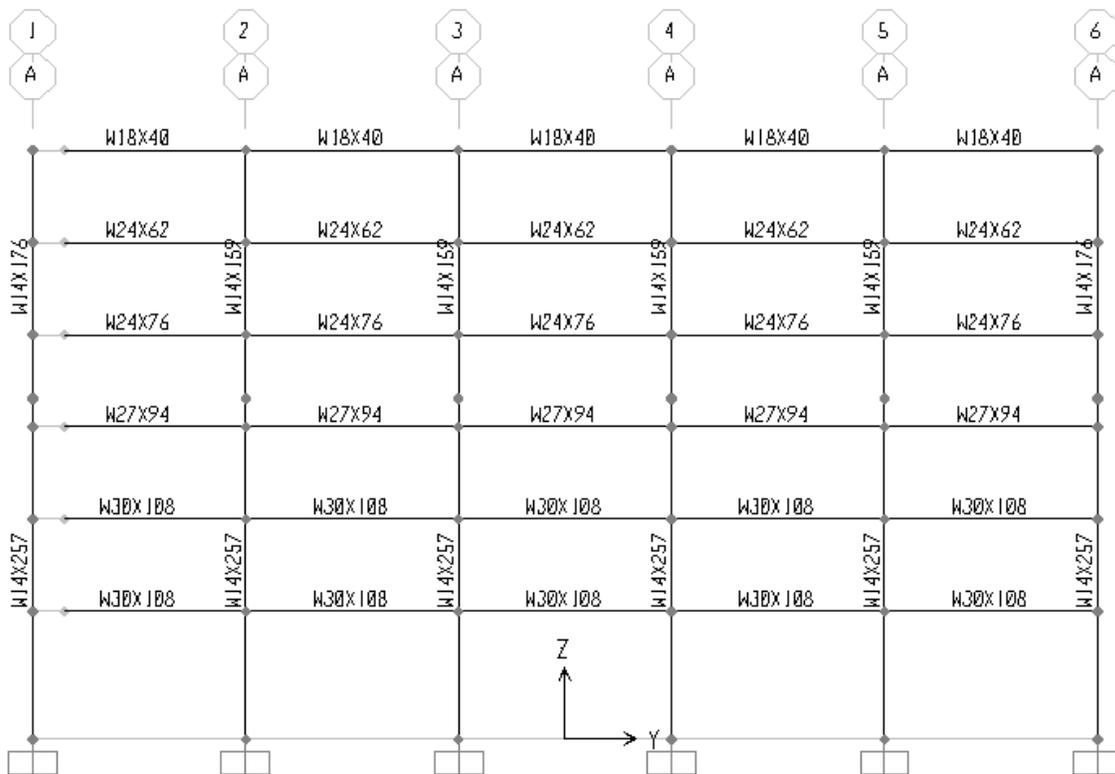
Elevation View of Six-Story Moment Frame as Beam
